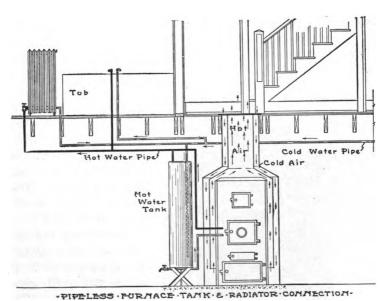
Illustrating method of heating bathroom with a water coil in a pipeless furnace.
